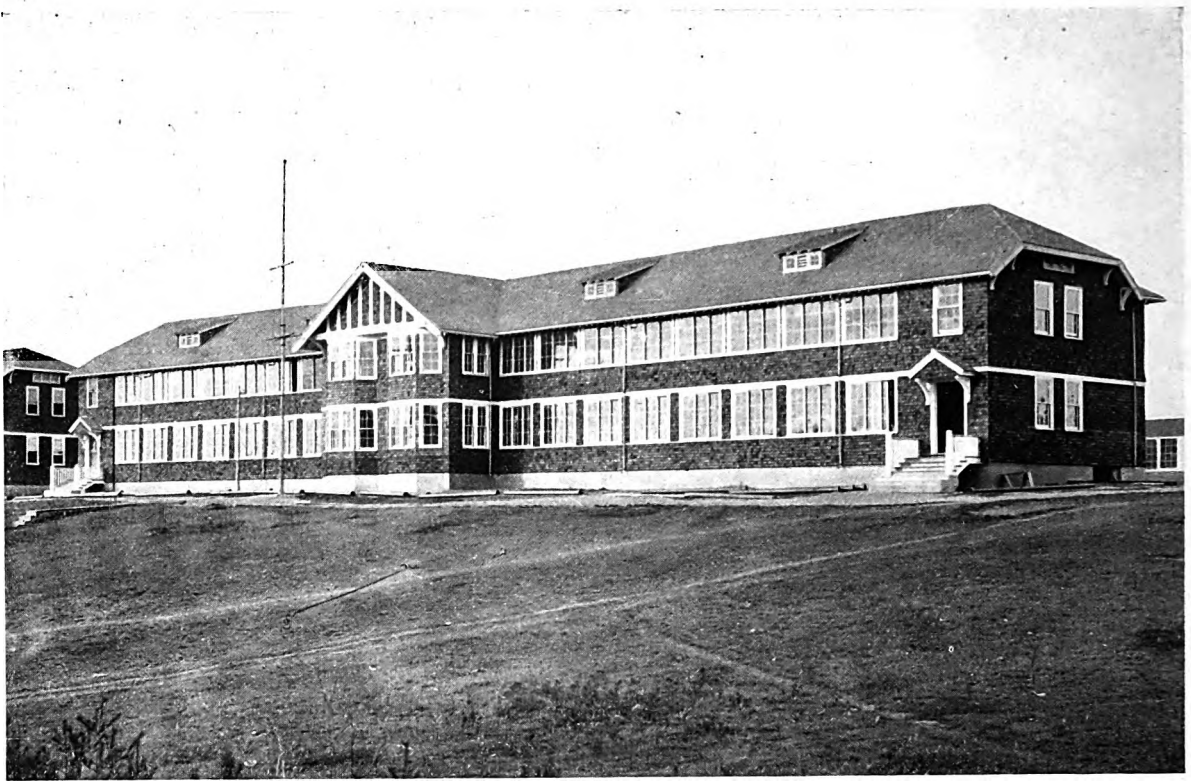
is a view of one of the pavilions when construction work was fairly well advanced. The lay-out of this building embodies many new features as is illustrated in Figure 49, which is a photograph of the actual plan. In observing this plan, it will be noted that each ward consists of 8 beds. A living-room of generous dimensions is in direct connection with the ward, and opening off ward and living-room is an open-air cure veranda. The screen shown on plan, between the ward and cure veranda, is composed of disappearing sash, and when the inclemencies of the weather are so extreme that the patients
